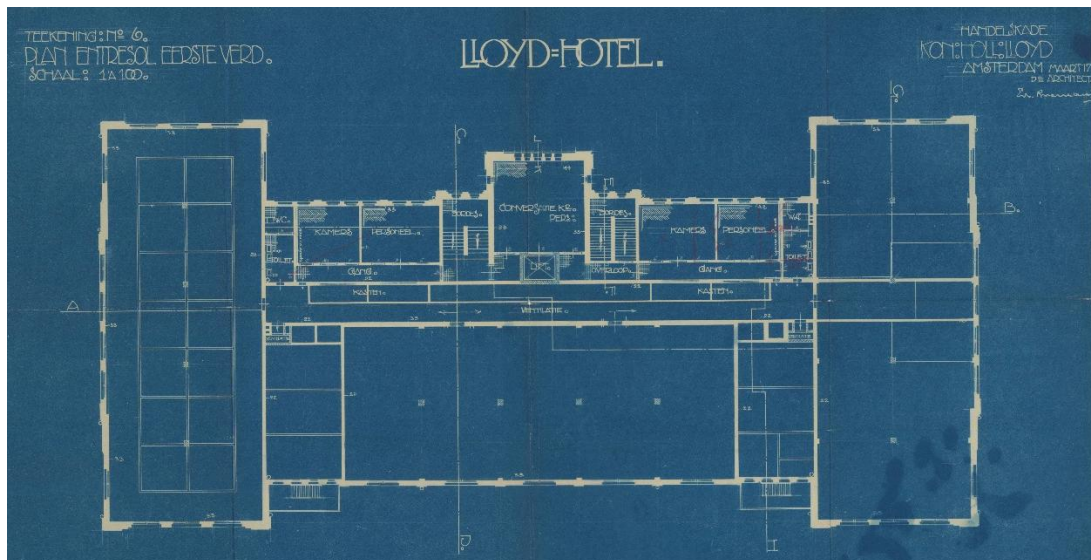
Floorplan first floor mezzanine Lloyd Hotel (Gemeente Amsterdam Archief; 24527; 10200289, 1917)
